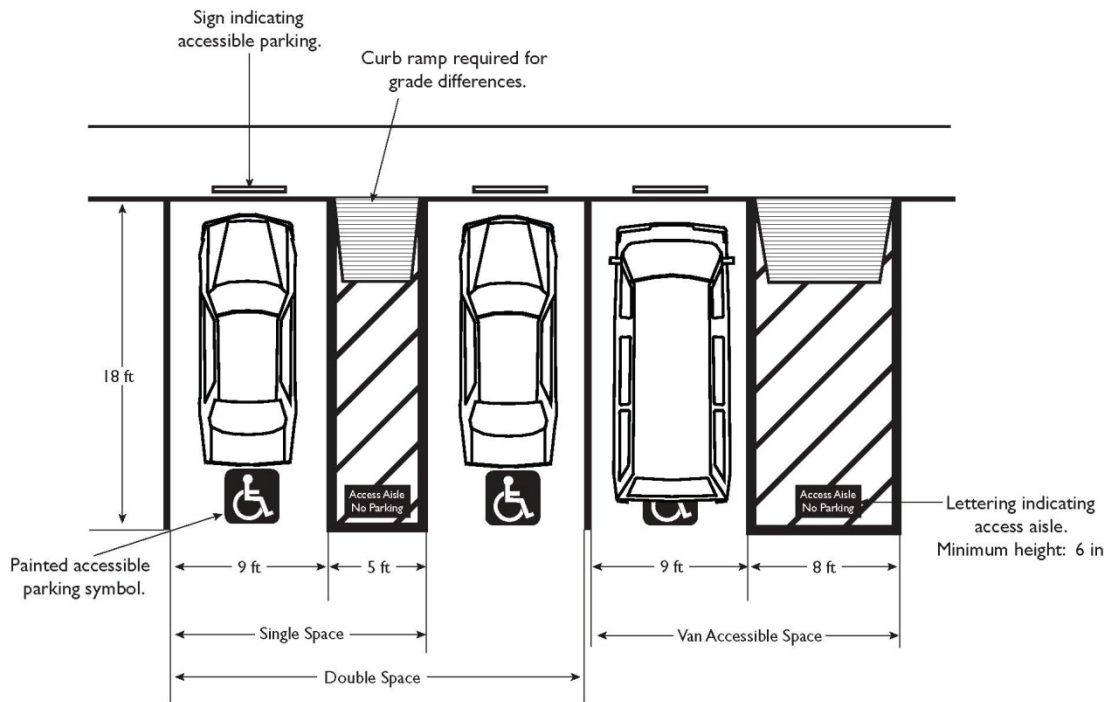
H: ACCESS AISLE DIMENSIONS
